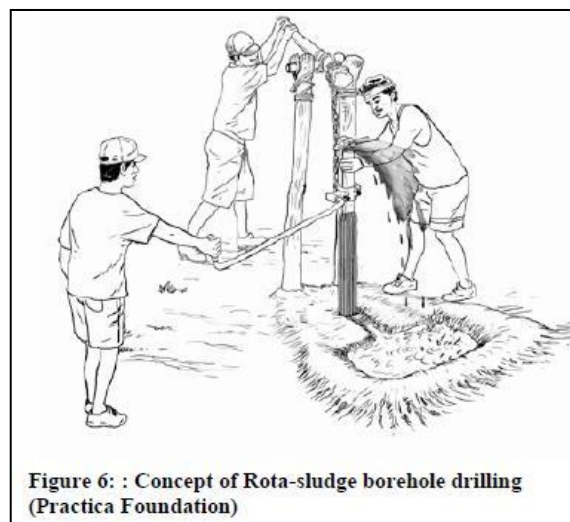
Concept of Rota-sludge borehole drilling (Practica Foundation)
